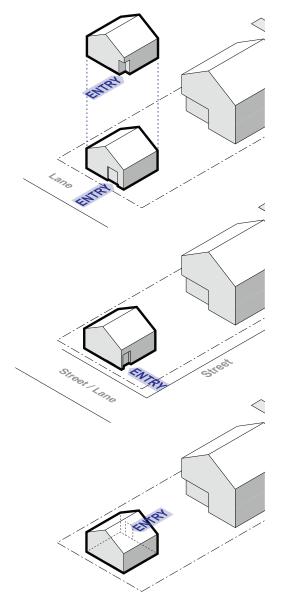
For lots with a lane or street, the entry should be oriented towards, or be visible from, the lane or street. For lots without a lane, the entry should be located on the side or interior yard.
